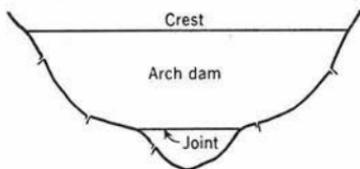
At sites where bottom of U-shaped valley has been eroded, section of dam to fill this area is poured first.
